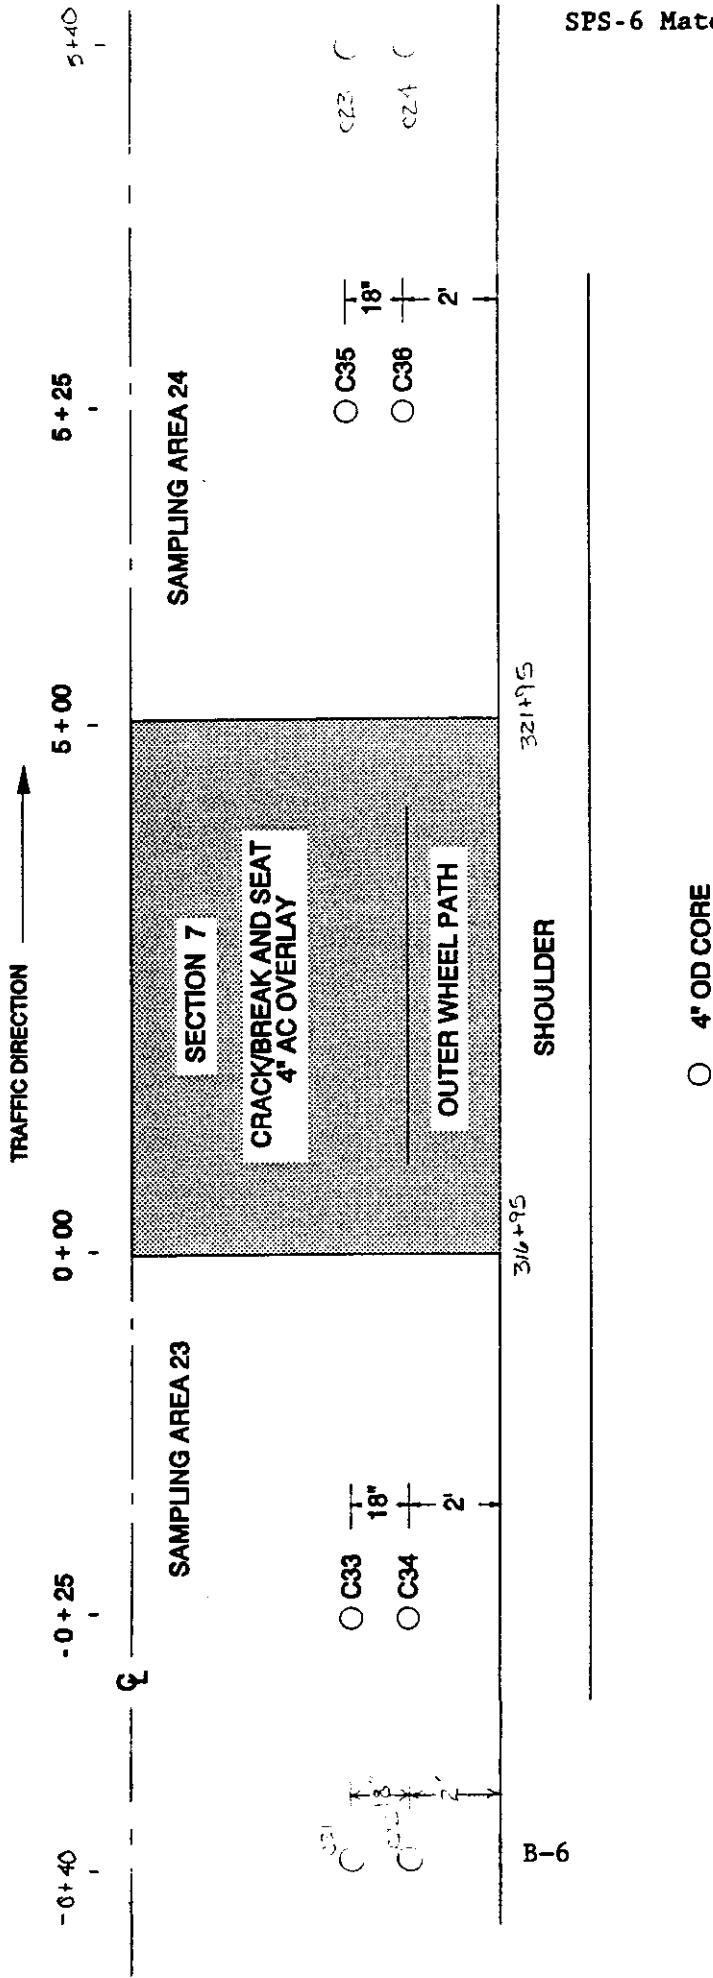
Example of "Post-Construction" Sampling Plan for Test Section 7
